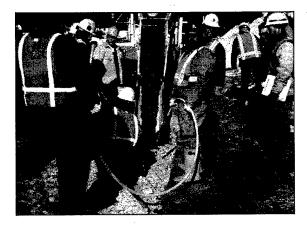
Preparing to consolidate the concrete with an internal vibrator.
